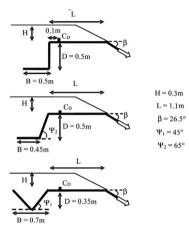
Anchor trenches for a fixed length of geotextile equal to 2.1 m.
